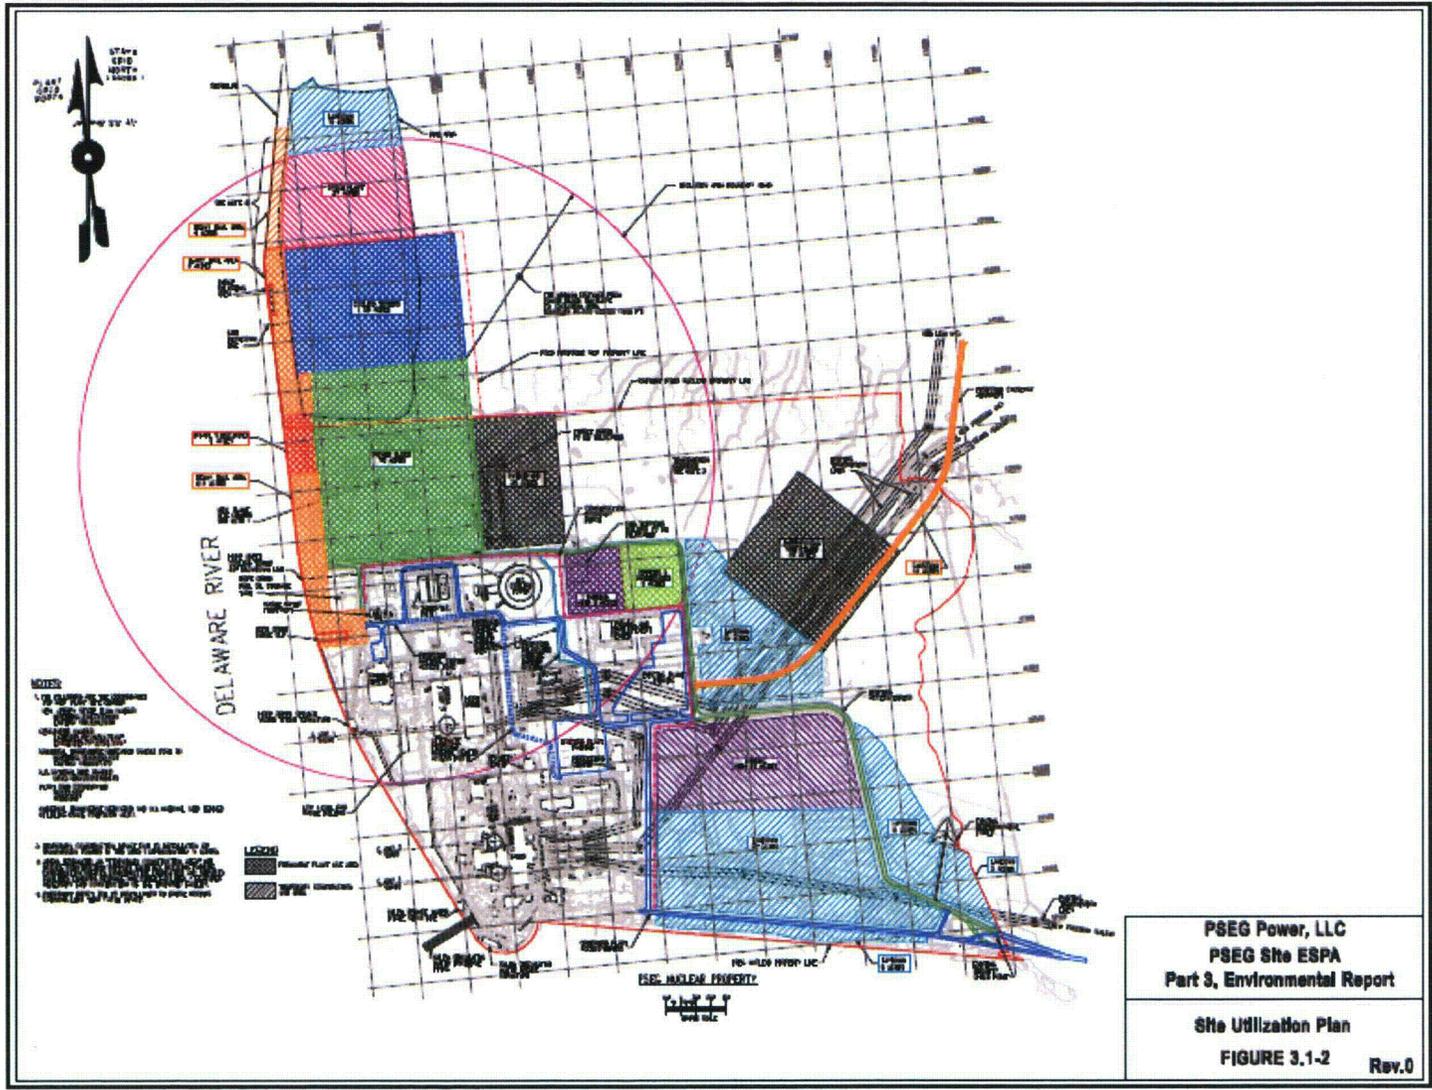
Site Utilization Plan for the PSEG ESP Site (Site 7-4)
